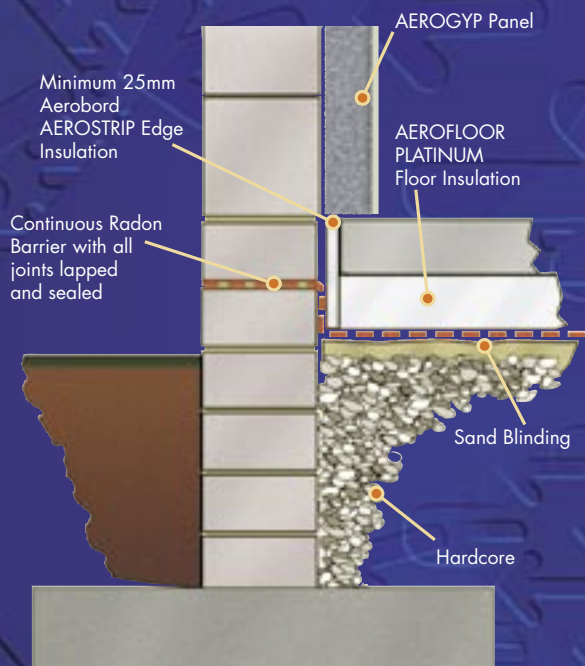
CONCRETE SLAB OVERLAY WITH HOLLOW BLOCK CONSTRUCTION
